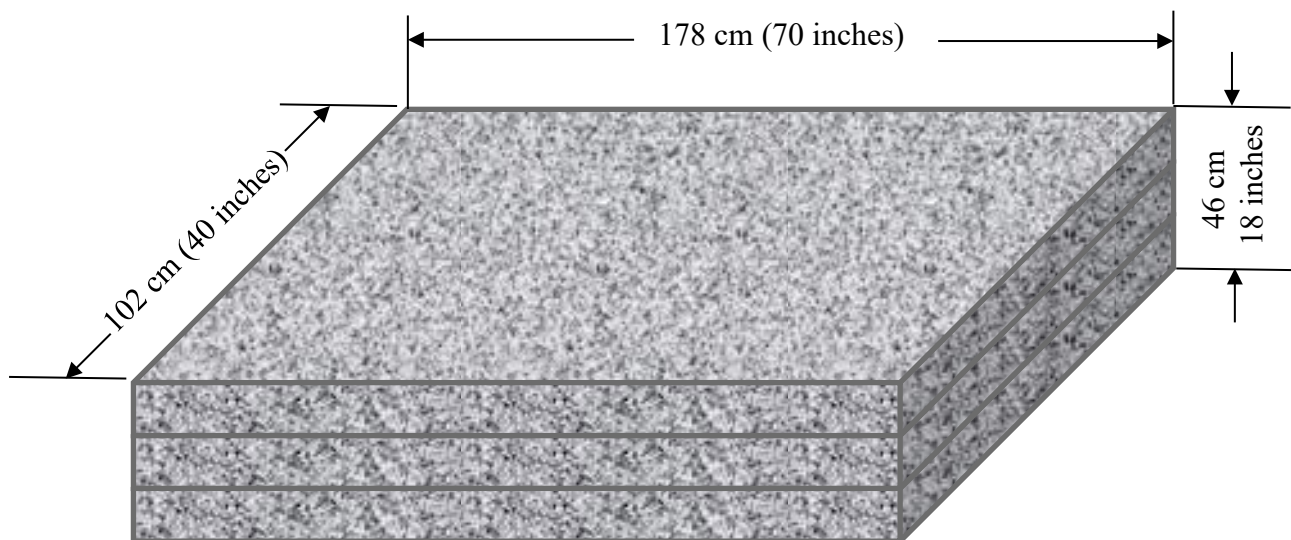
Dimensions of the soil after placement and compaction in the test pit.
